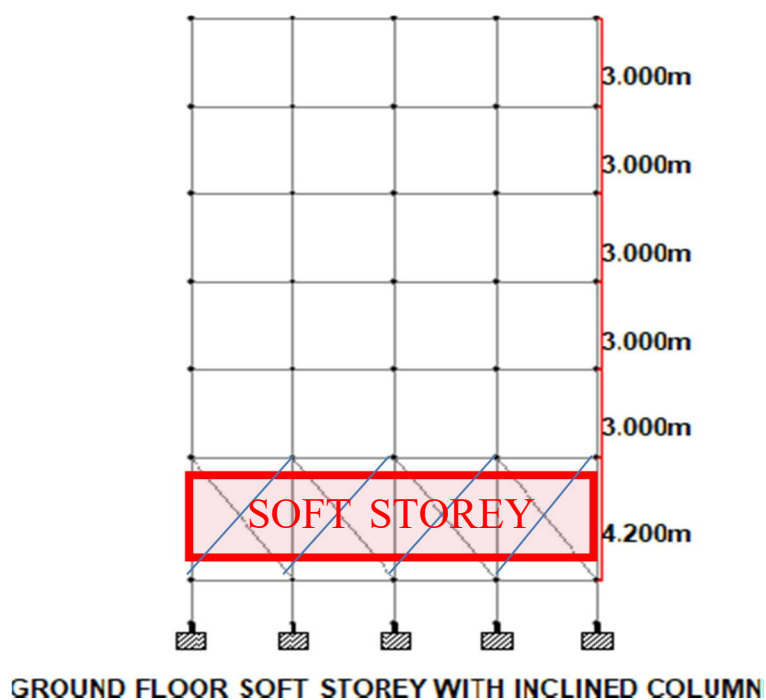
7 Ground Floor Soft Storey With Inclined Column (CASE V)
